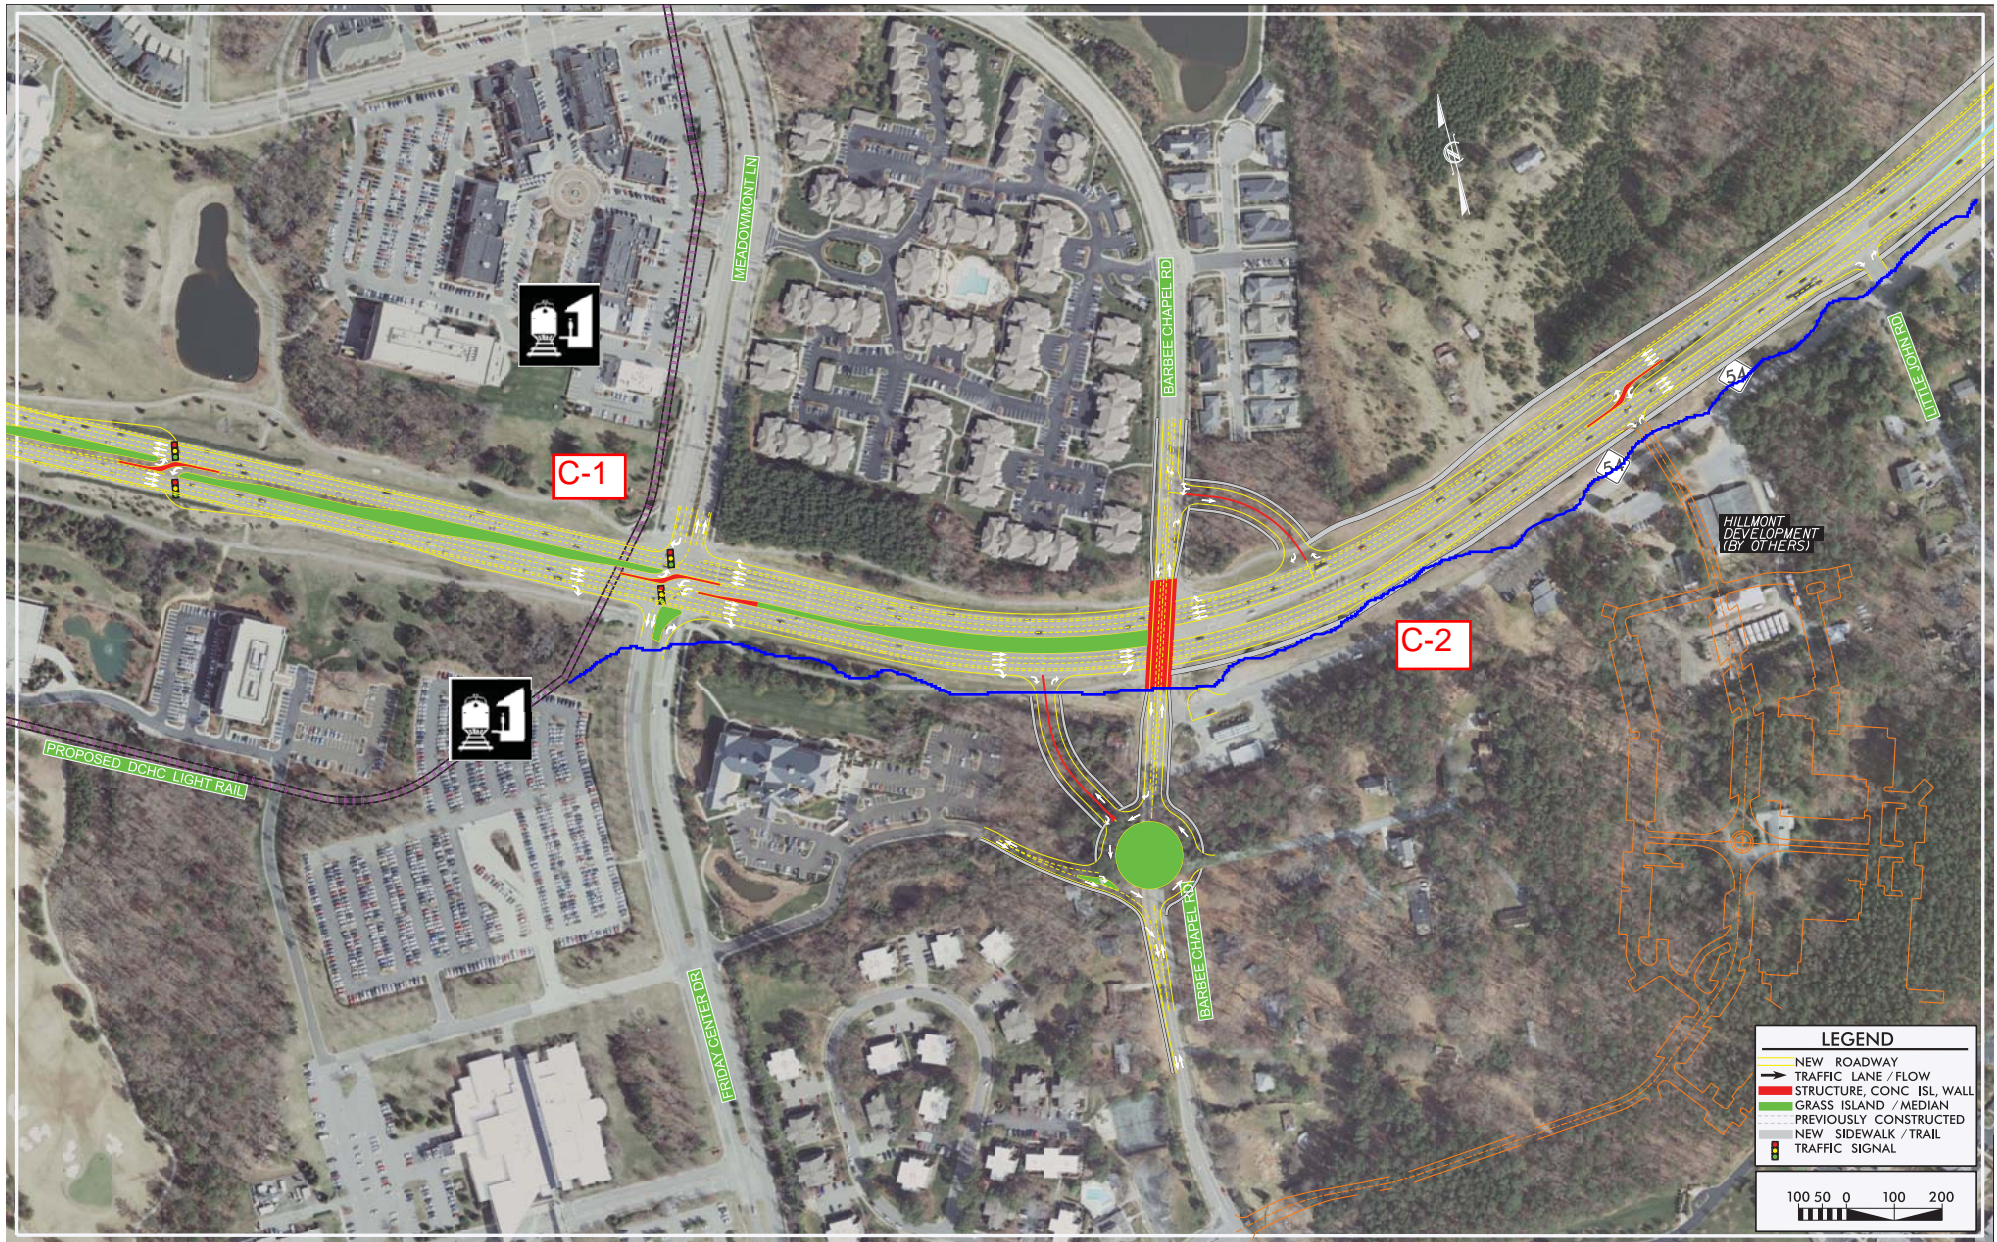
Combined NC 54 Roadway Recommendations Sheet 3 - Meadowmont Lane/Friday Center Drive to Little John Road
